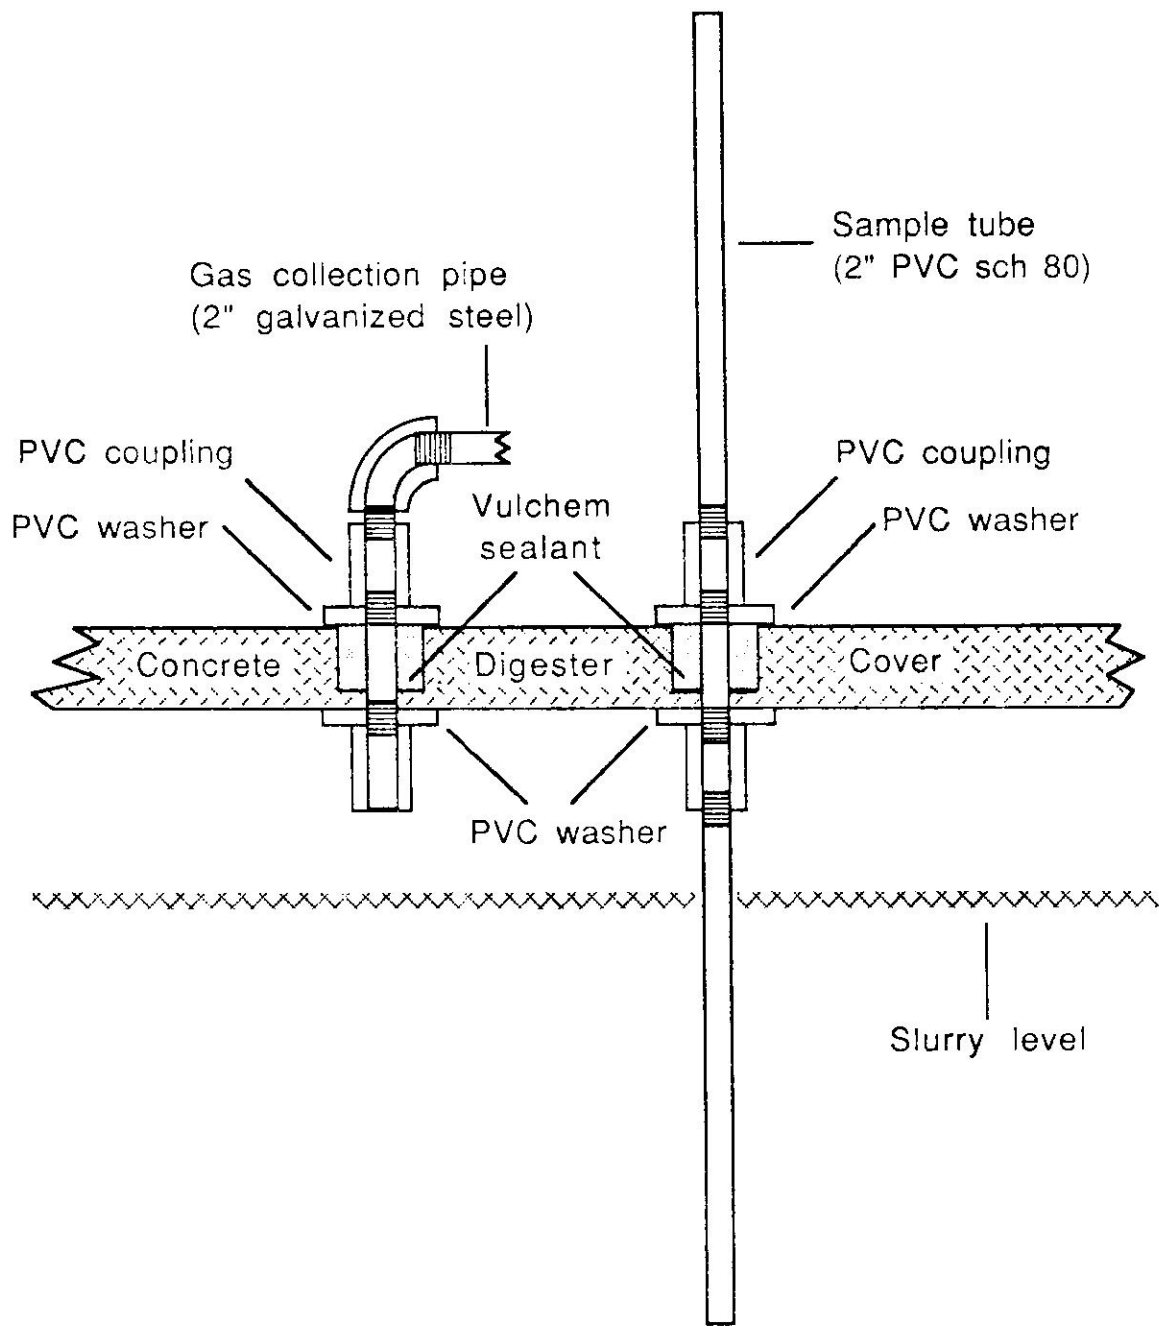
Mounting of a gas collection pipe and a sample tube in the digester cover.
